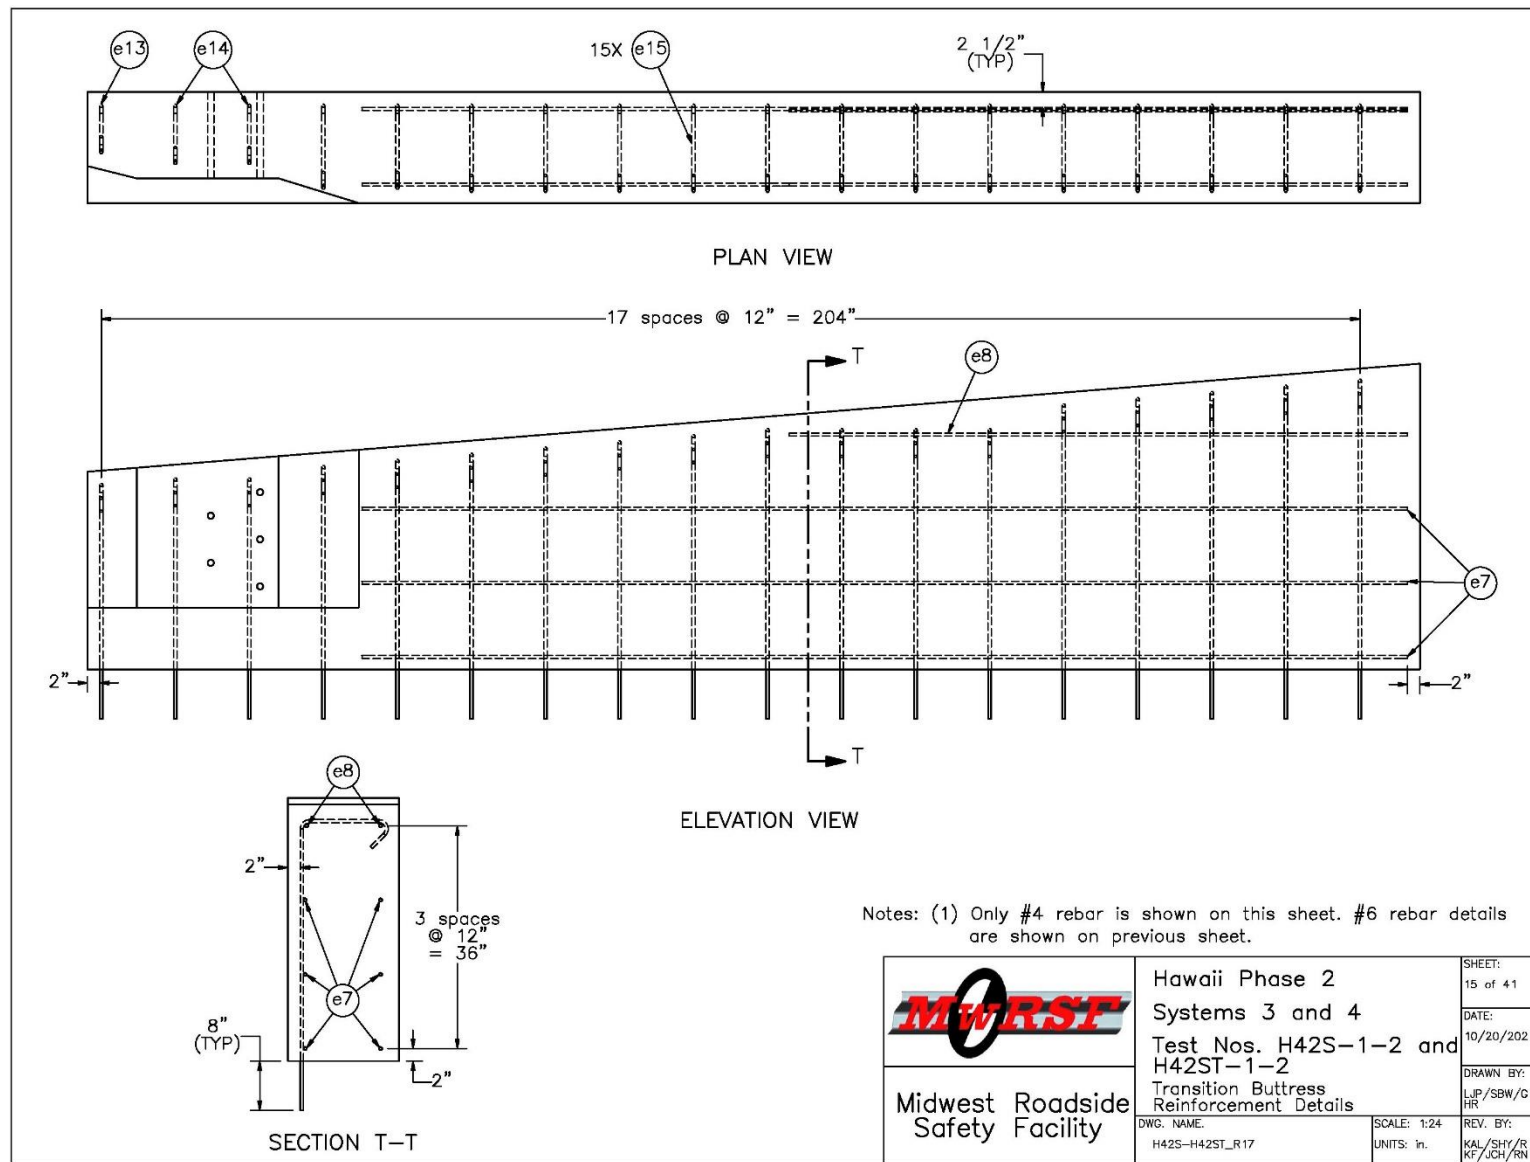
Transition Buttress Reinforcement Details, Test Nos. H42S-1 and H42S-2
